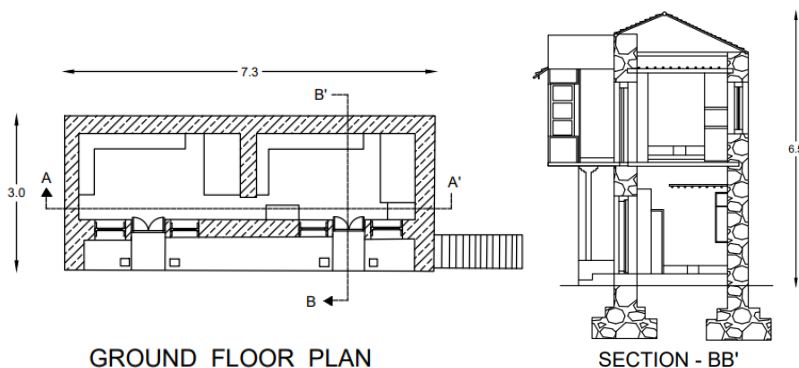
Floor Plan,Section and elevation of Mud house of Poombharai
